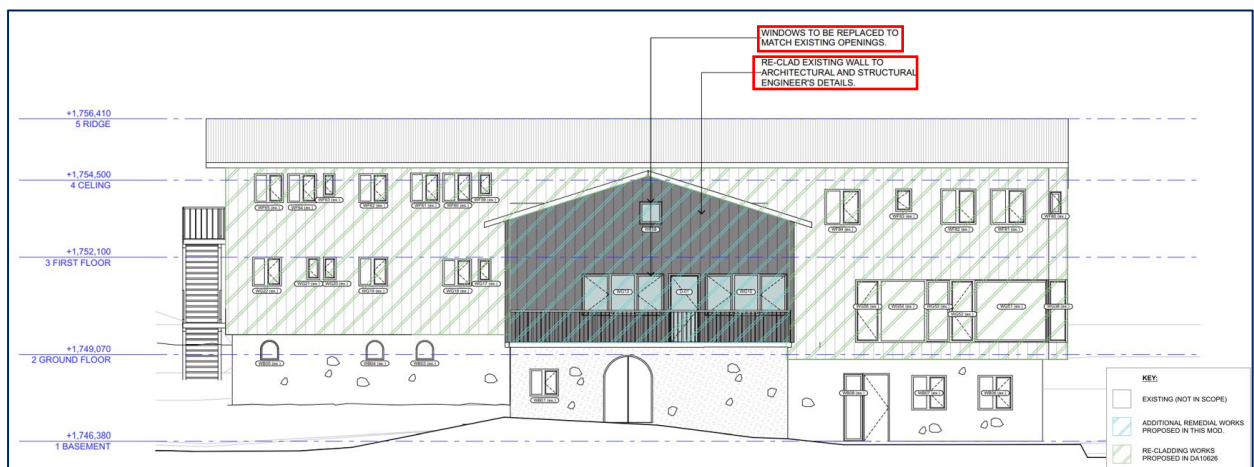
| Proposed modification to cladding and windows (Source: Applicant's architectural plans 2025)
